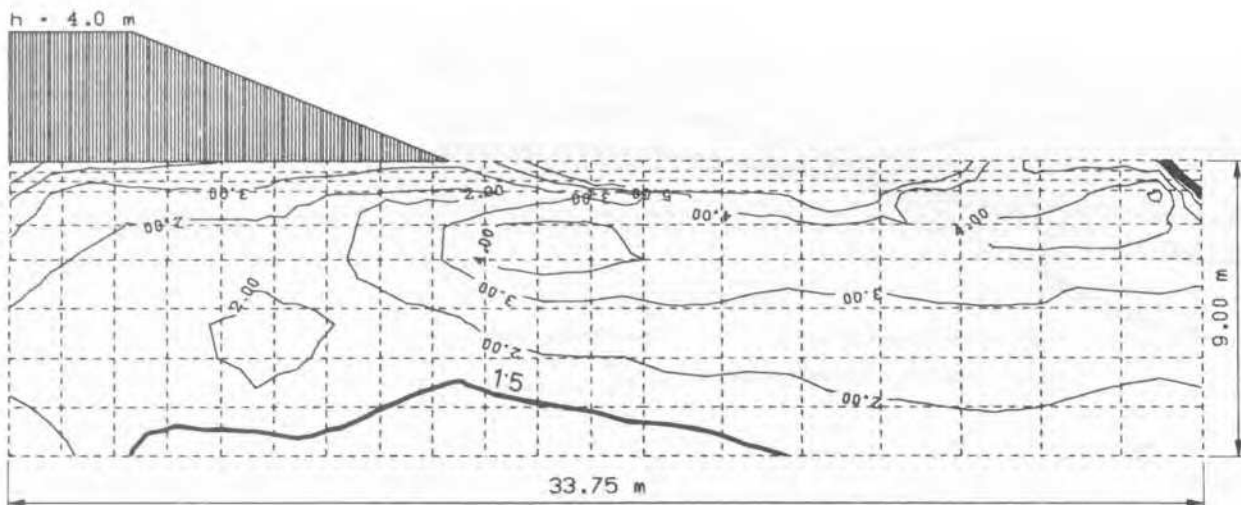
Road embankment: undrained conditions. Isolines τ_f^0 / τ^0 in the case of single reinforcement, height 4 m .
